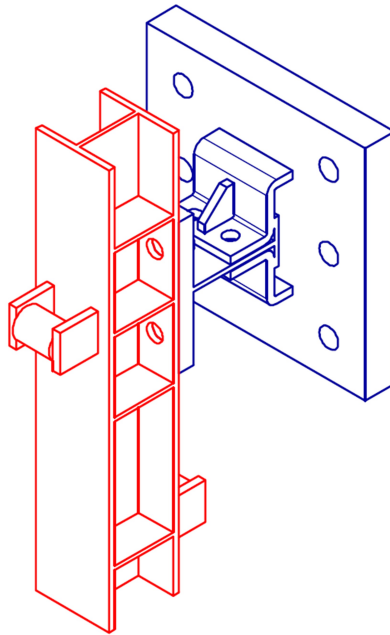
HEA100 load beam (red) to specimen (blue) detail
